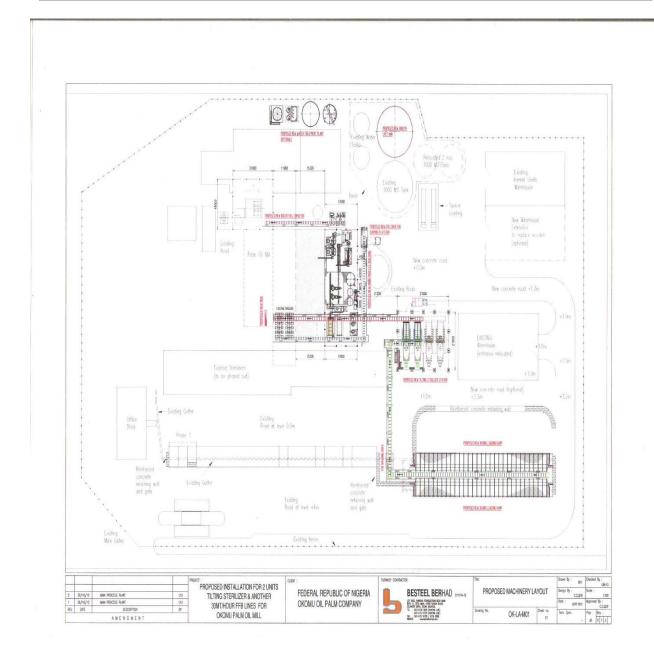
Technical Drawing of Proposed Machinery Layout
